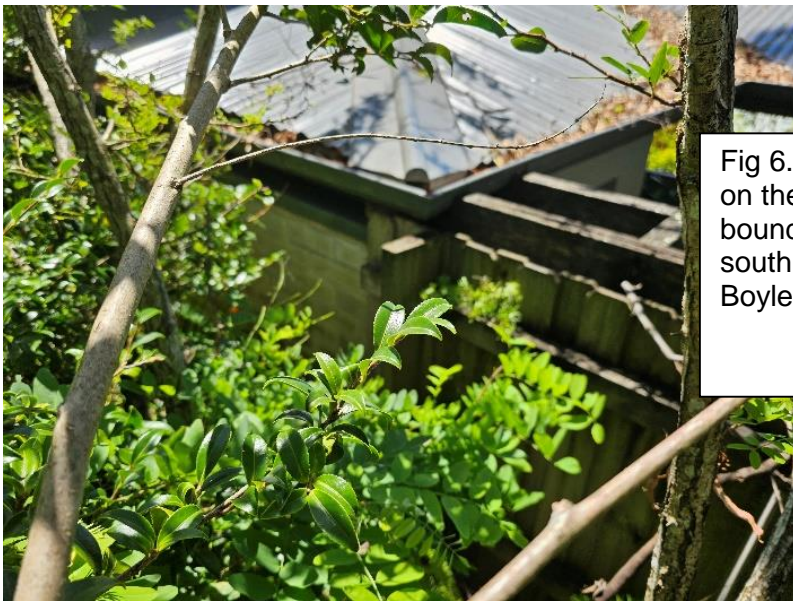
South side of 31 Boyle St. The wall is on the southern boundary of 31 Boyle. The boundary fence (out to Boyle St) abuts the south eastern corner of brick walling on 31 Boyle.
